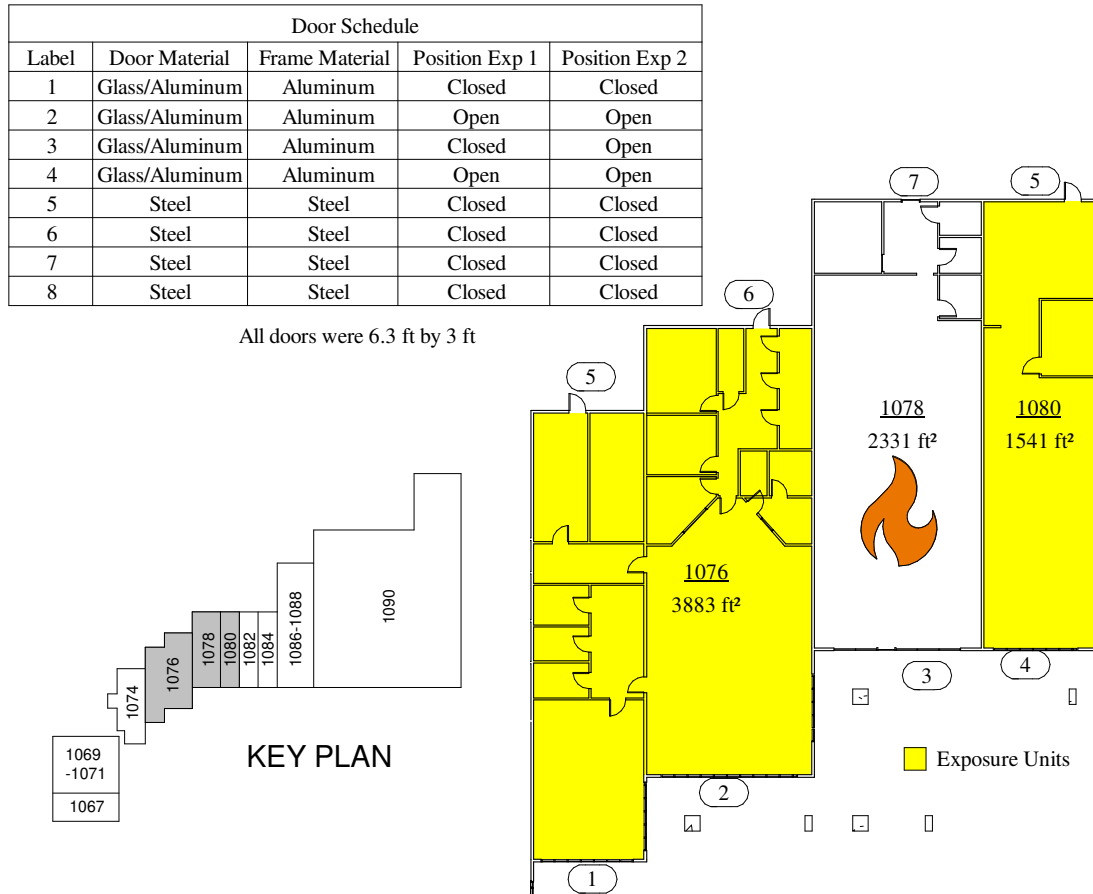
Floor plan of units 1076, 1078, and 1080.
